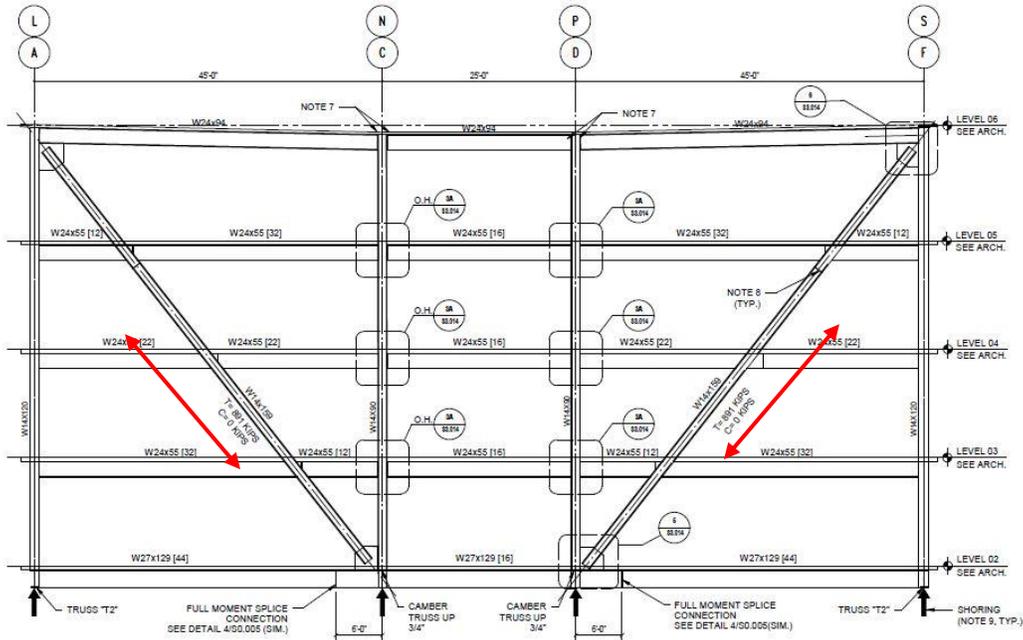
Truss T1 Elevation Highlighting Tensile Forces
